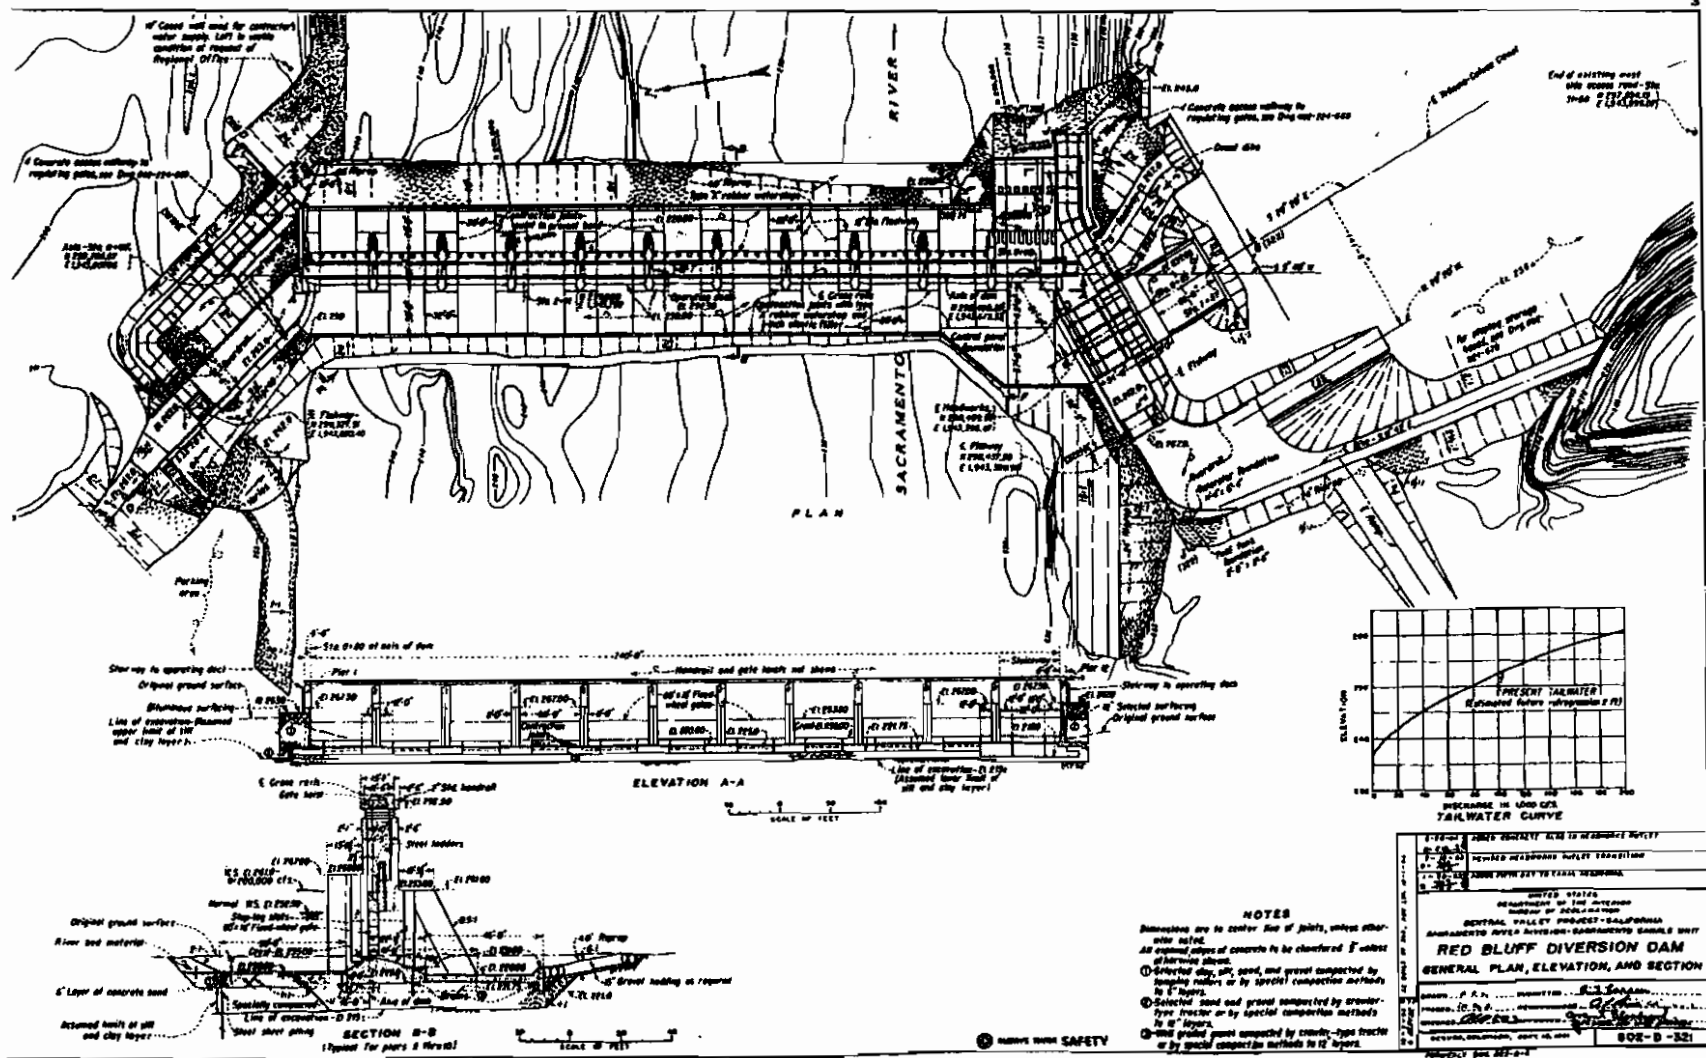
Plan and sections of Red Bluff Diversion Dam.
